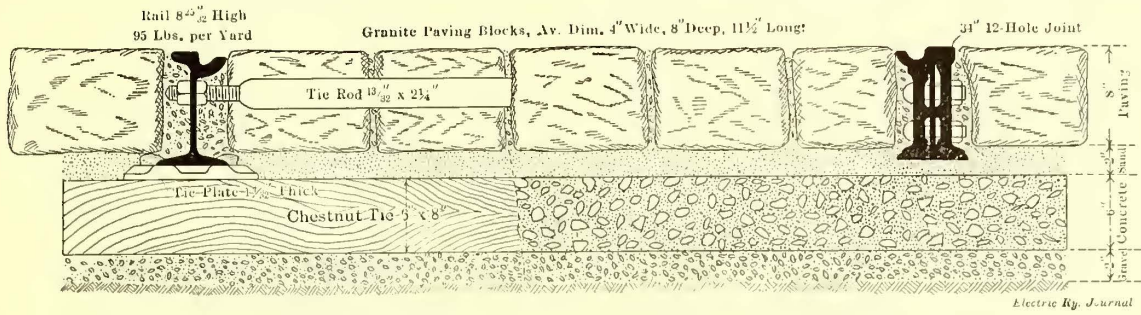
Boston Elevated Railway—Gravel Ballast Construction in Paved Streets
